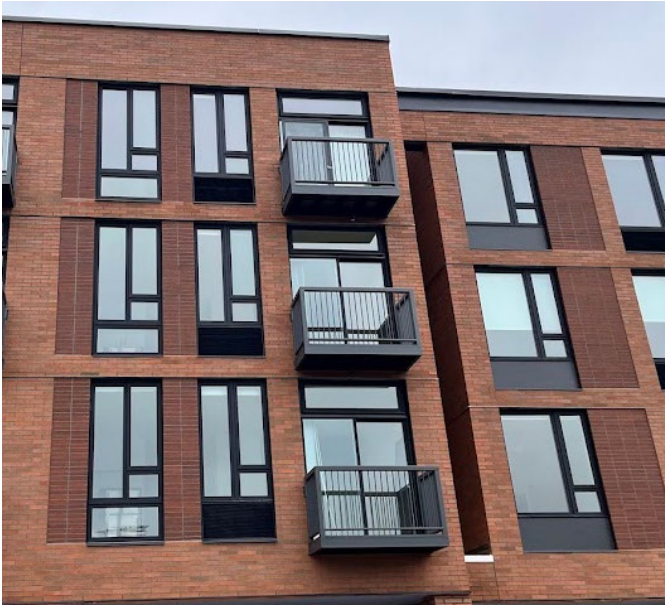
(B)(8)(S1). The building façade is comprised of primary materials, including brick, glass and metal panels.
